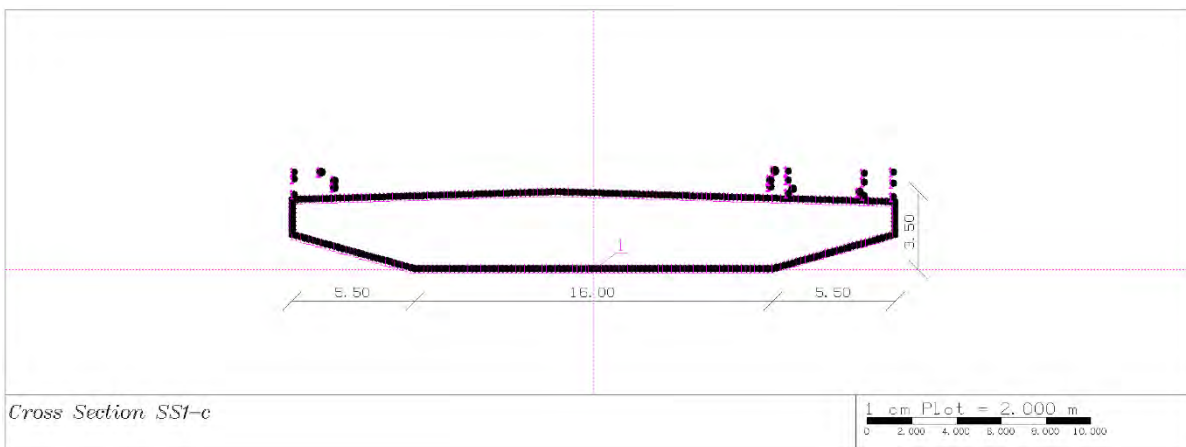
Finite element model of SS1 cross section, used for previous design cross section.
